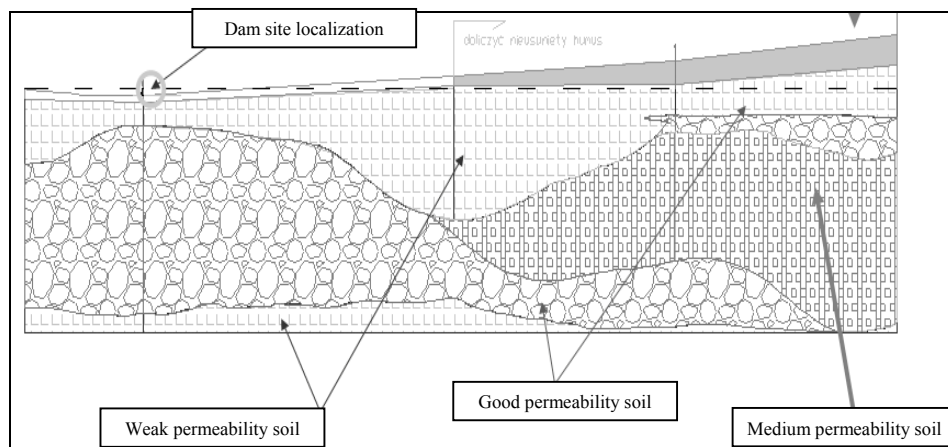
Geotechnical section no. III–III, along the reservoir area
